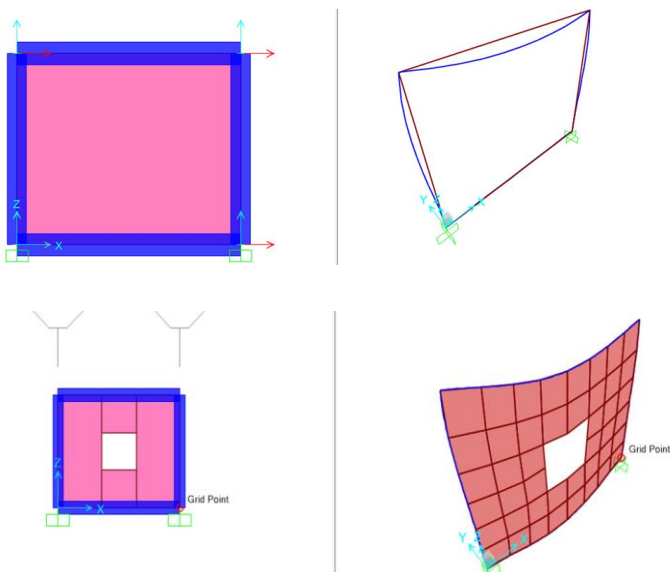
(a) Frame with masonry infill without opening (b) Frame with opening but without lintel beam and lintel band (c) Frame with lintel beam above the central opening
